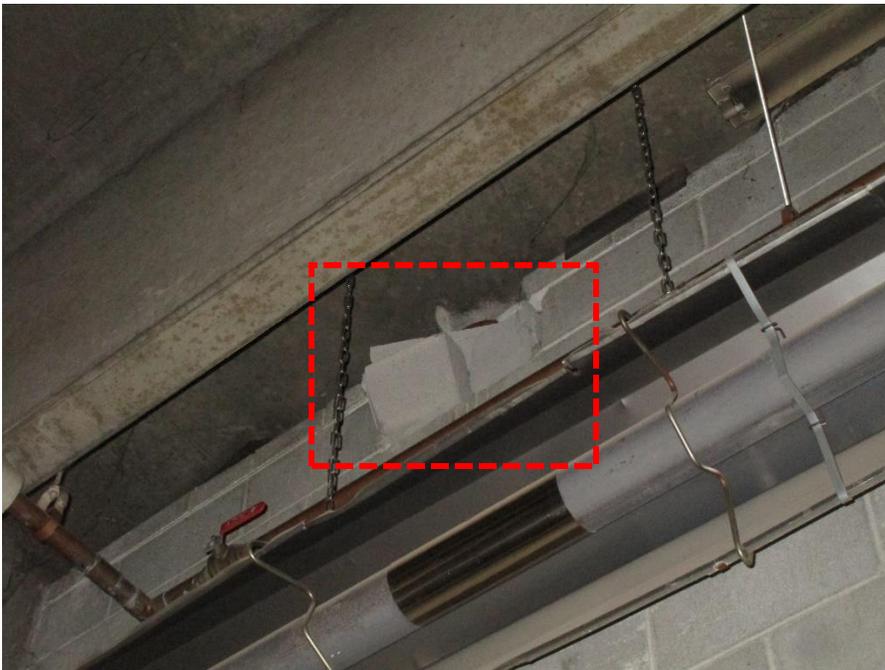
Face shell failure (highlighted in red box) in CMU partition wall near Column F/15.
